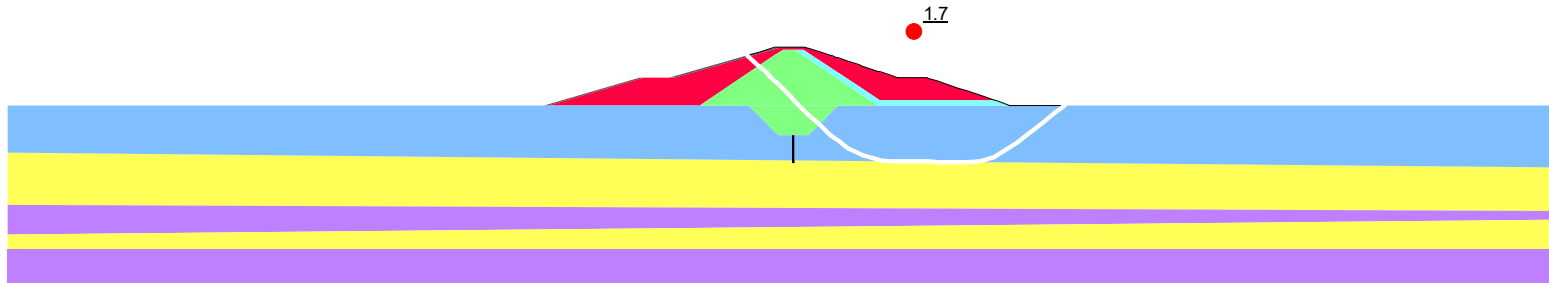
Alternative 2 End of Construction Downstream Factor of Safety— Walnut
